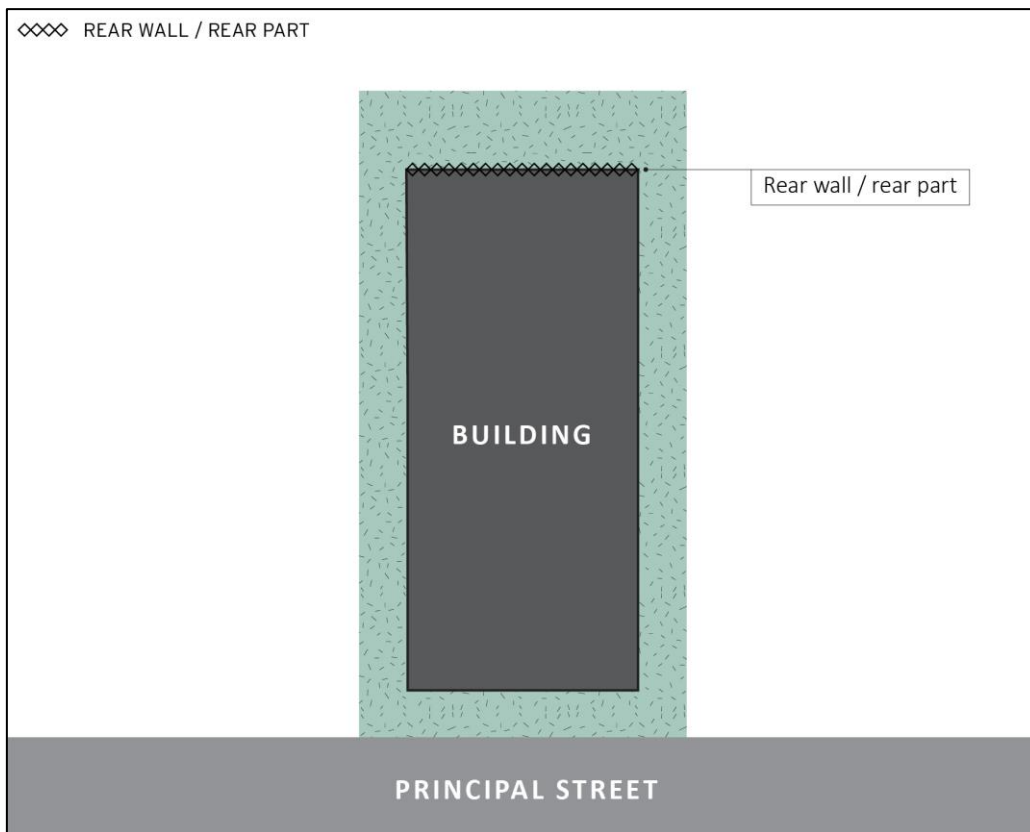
Modifications and alterations, including demolition, are exempt to the rear wall/rear part of building
